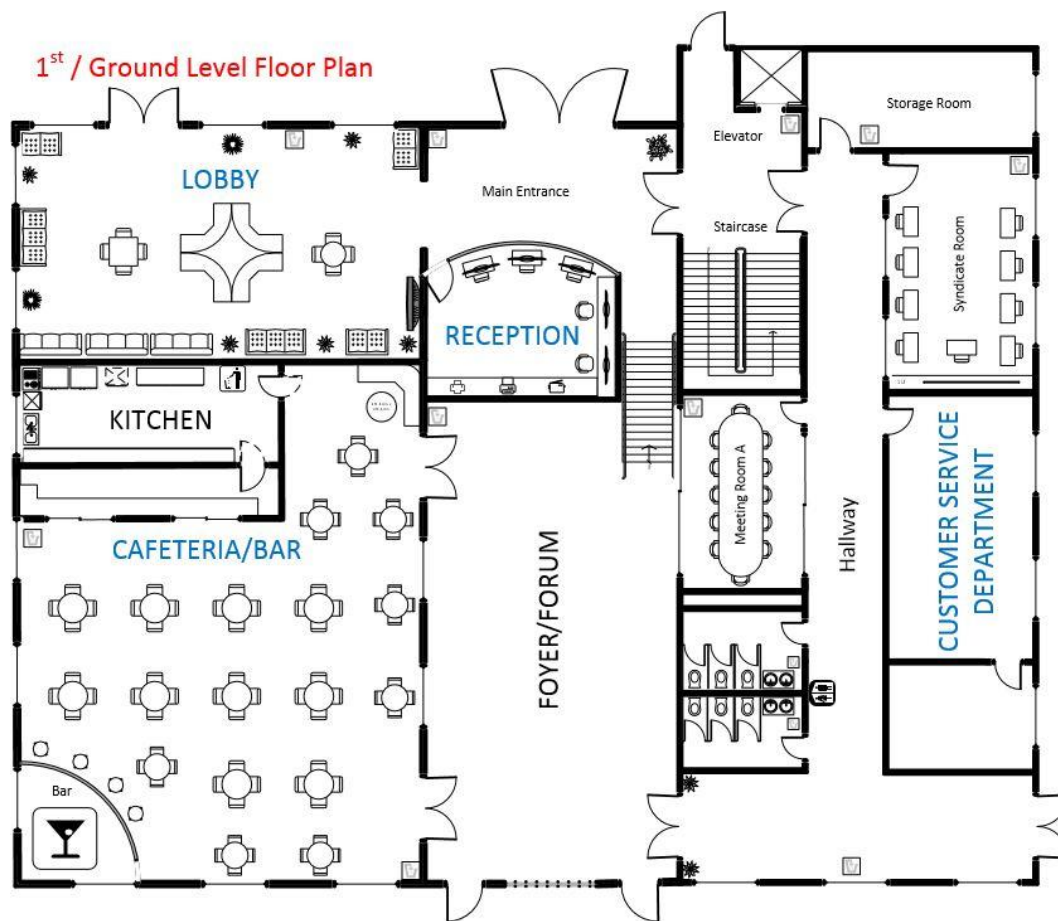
1ST / GROUND LEVEL FLOOR PLAN
